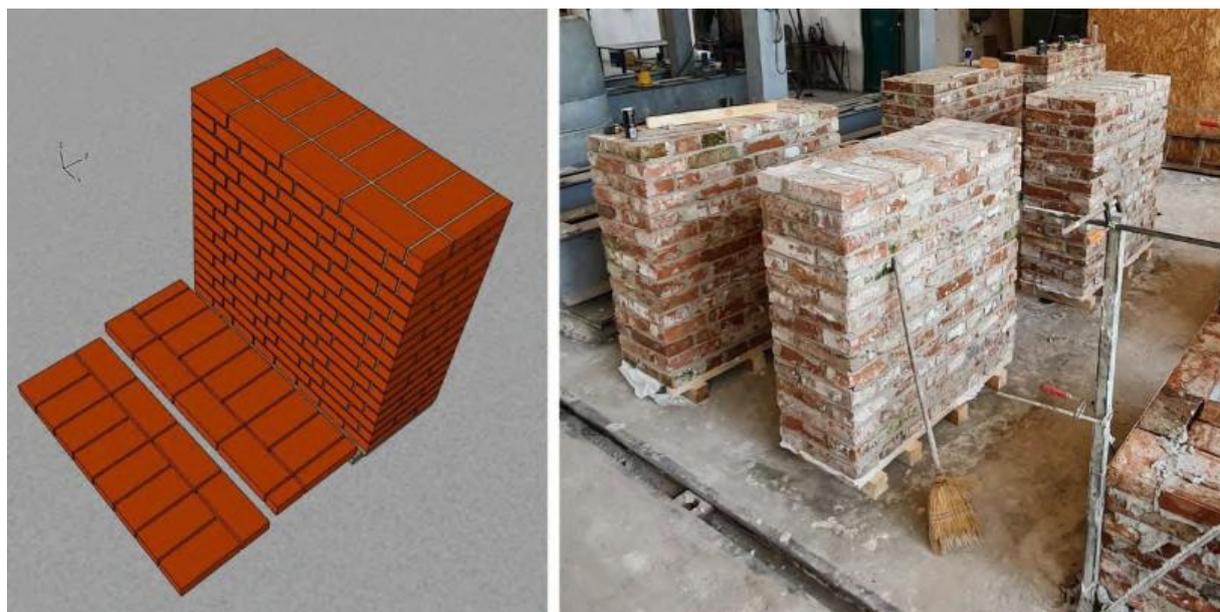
Masonry tested specimens (images from D. Bocan PhD thesis ©)
